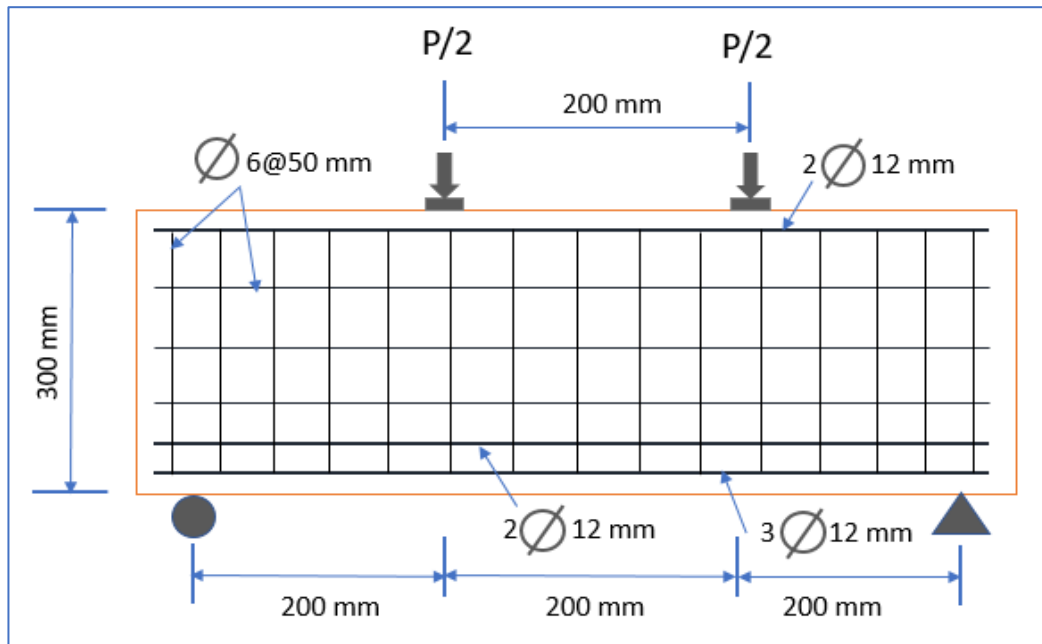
Details of the dimensions of the deep beams with reinforcing steel
